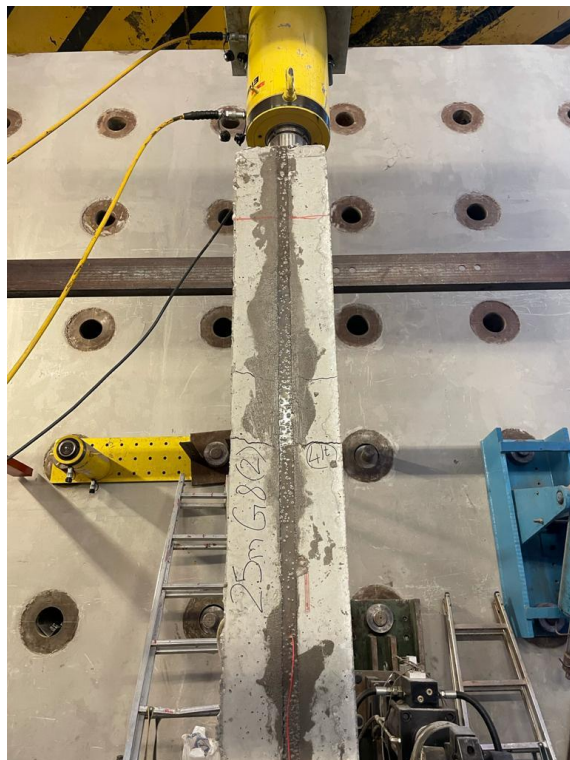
Cracks at the tension side of Column 2.5-C08-2
